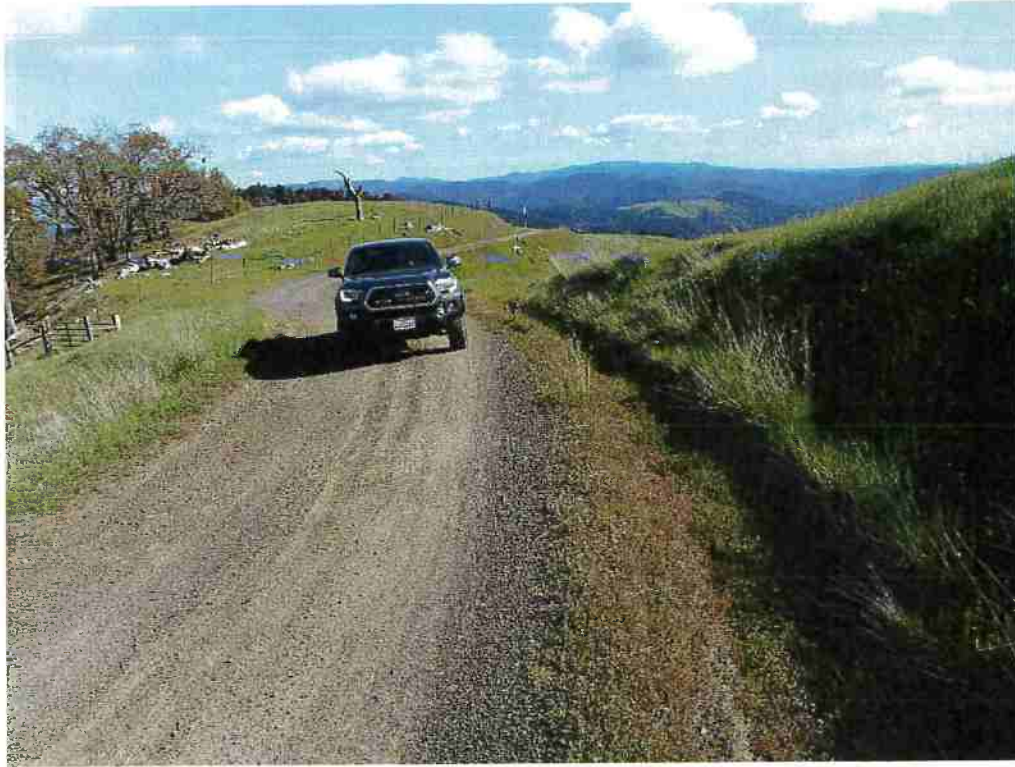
RP 3. Inboard ditch and location of lead-out ditch. Vehicle traveling north. Photo taking facing south.
